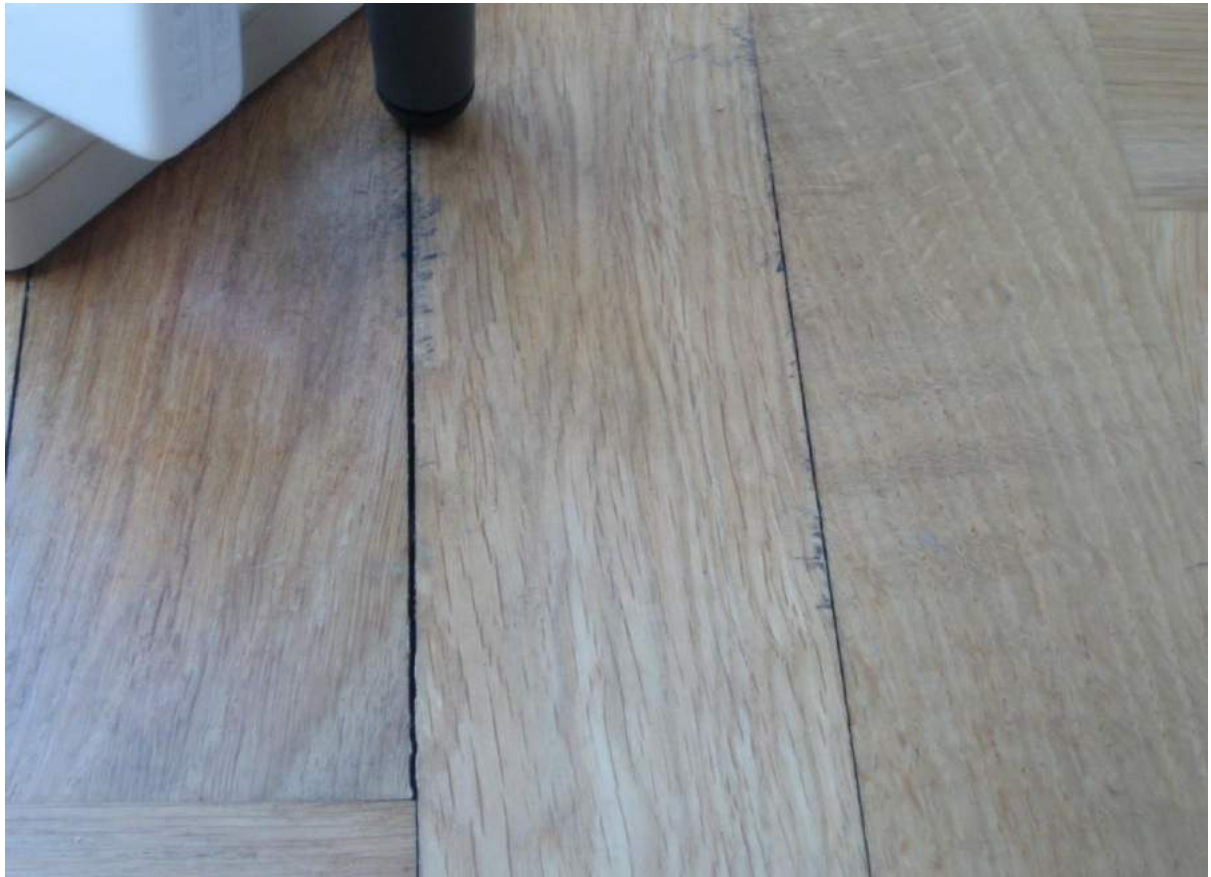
Water damage to parquetry flooring at living room window assembly in Unit 306.
